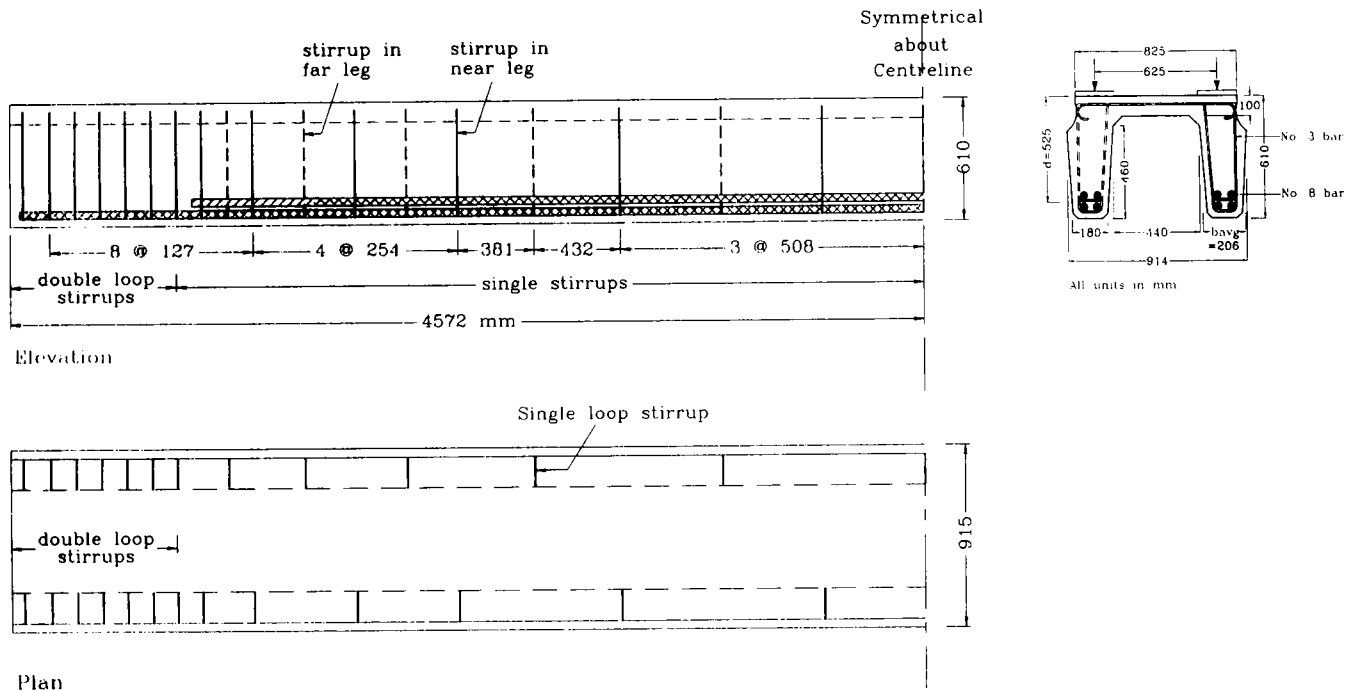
Typical elevation, plan and cross section of Type-E girder.
